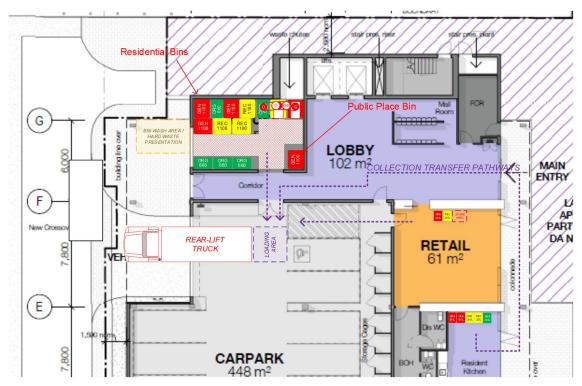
Apartment Building Residential, Retail, Kitchen Amenity and Public Place Waste Storage areas – Concept only
